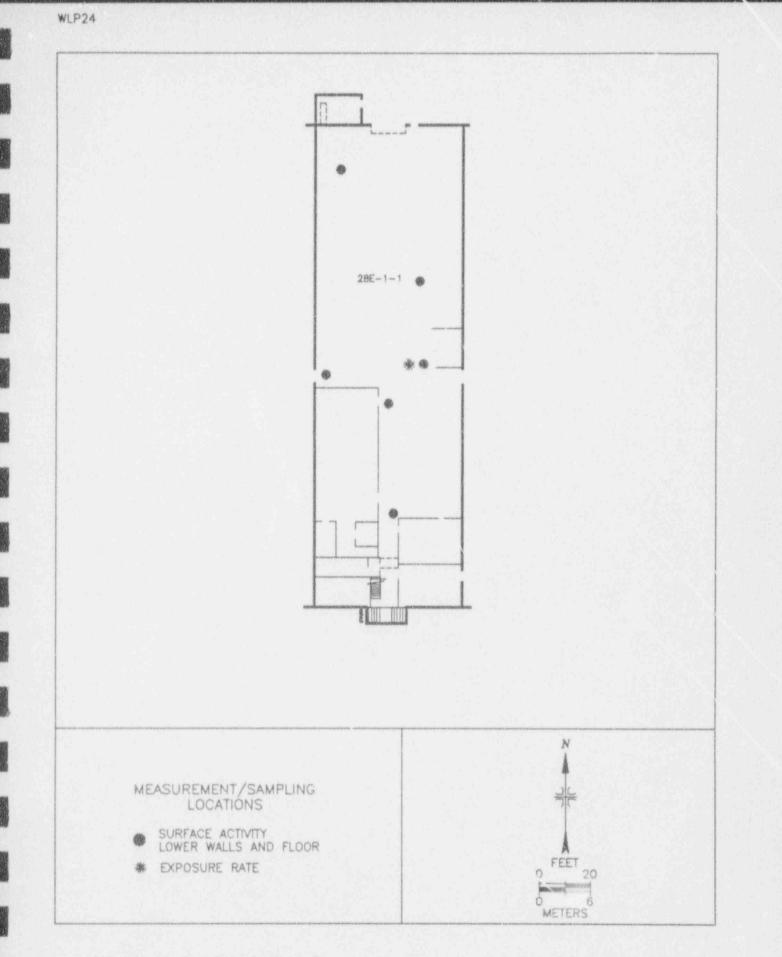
Building 8, First Floor - Measurement and Sampling Locations
